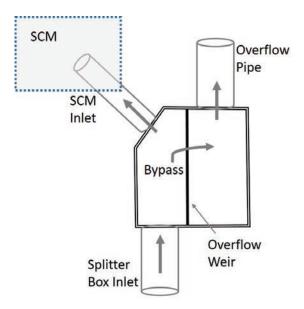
Flow splitter box with one inlet, a pipe outfall to the stormwater control measure (SCM) and overflow pipe (Source: MCES, 2001).
